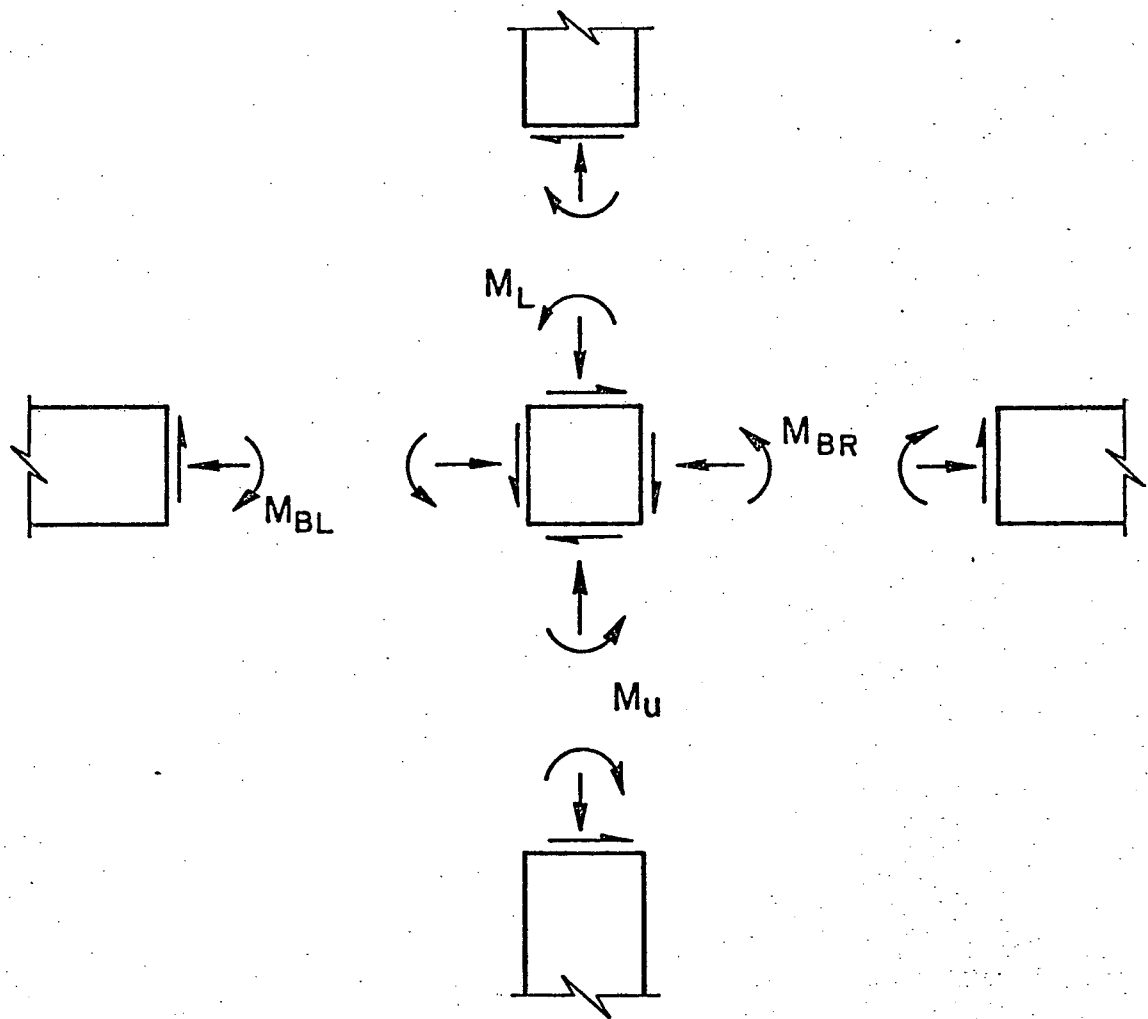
ASSEMBLAGE AND SUBASSEMBLAGES
